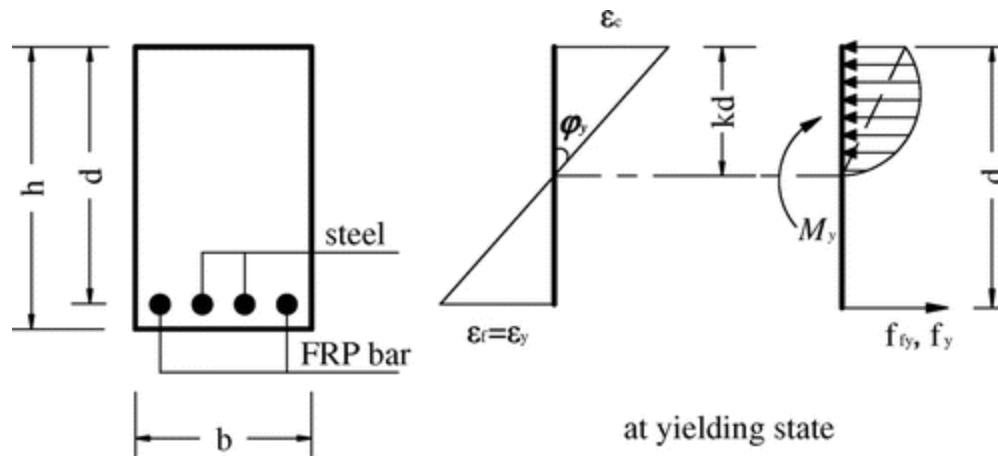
Stress-Strain on a Hybrid Steel-FRP rebar reinforced concrete section
